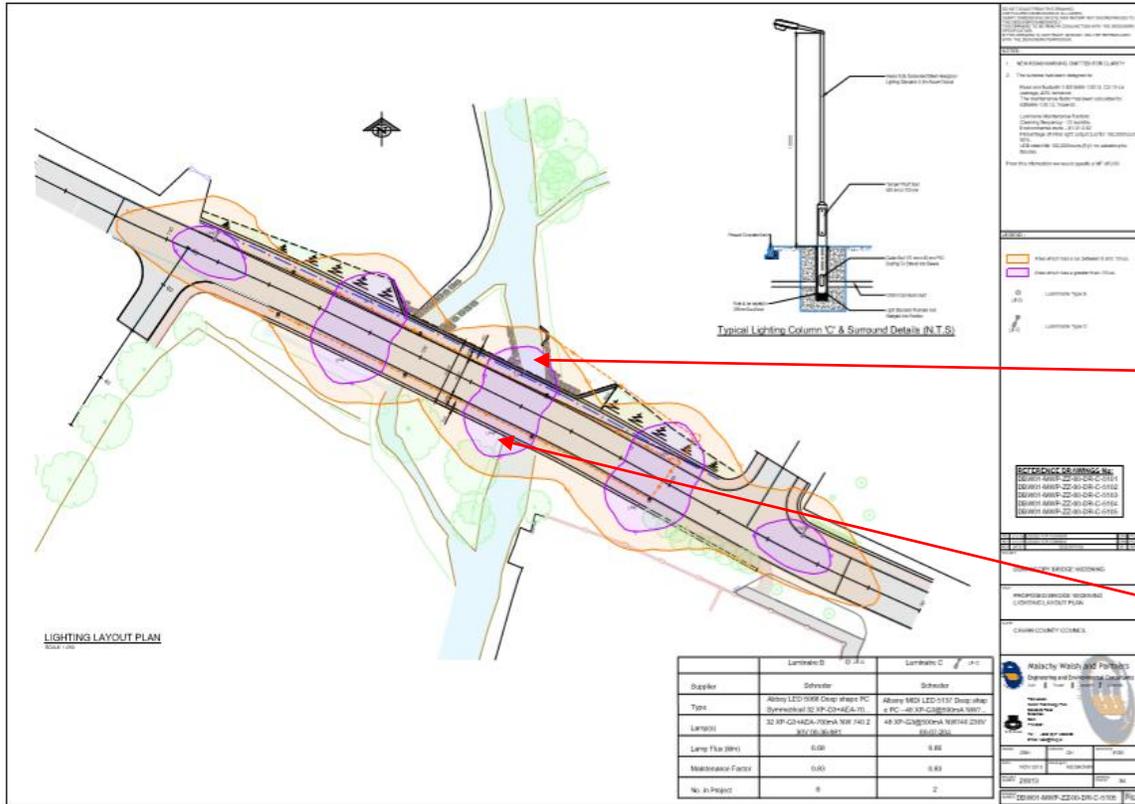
Showing proposed lighting of carriageway over Dunancory Bridge. The light spillage onto the river must be reduced as it will deter bats from commuting/foraging
